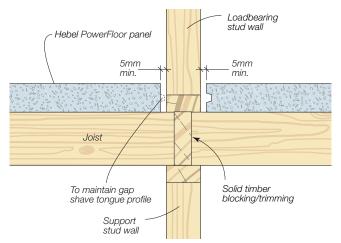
Hebel PowerFloor End Support for Fitted Flooring
